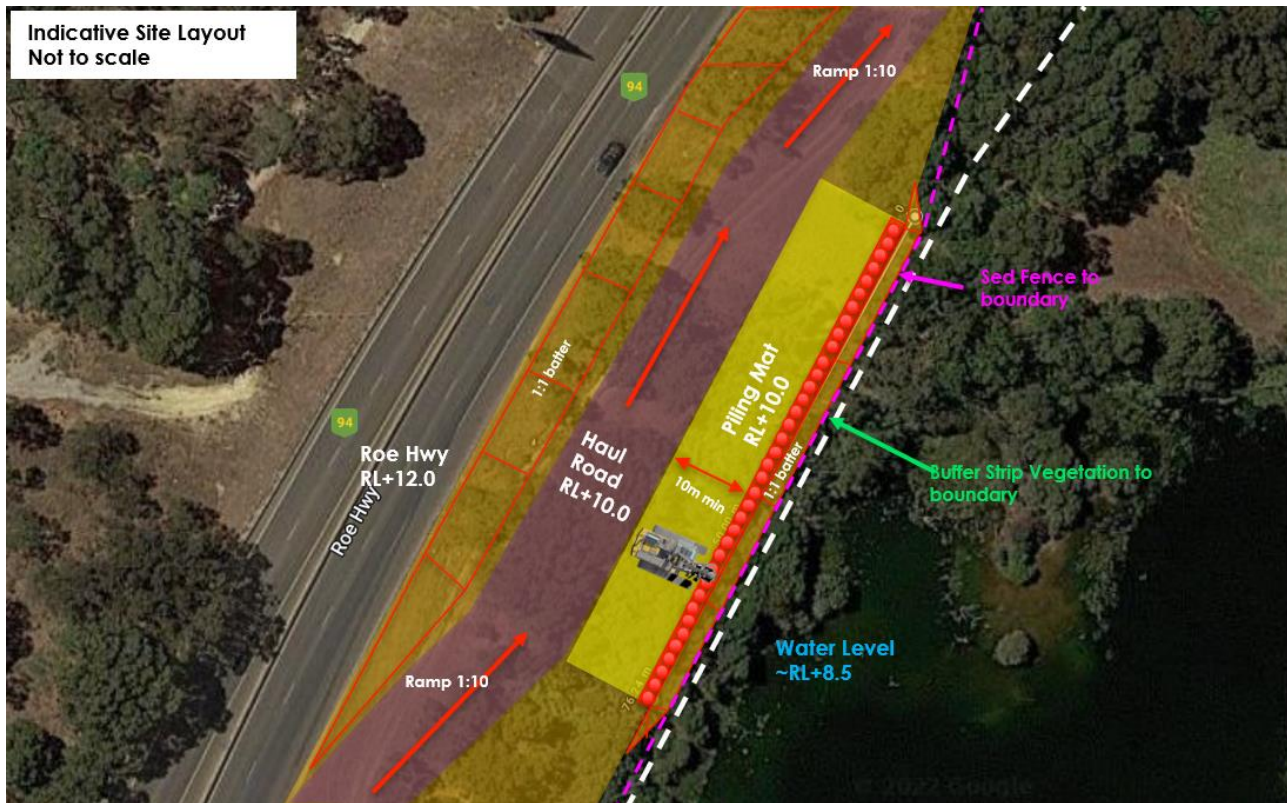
Retaining Wall (RW-U3) indicative Site Layout during construction
